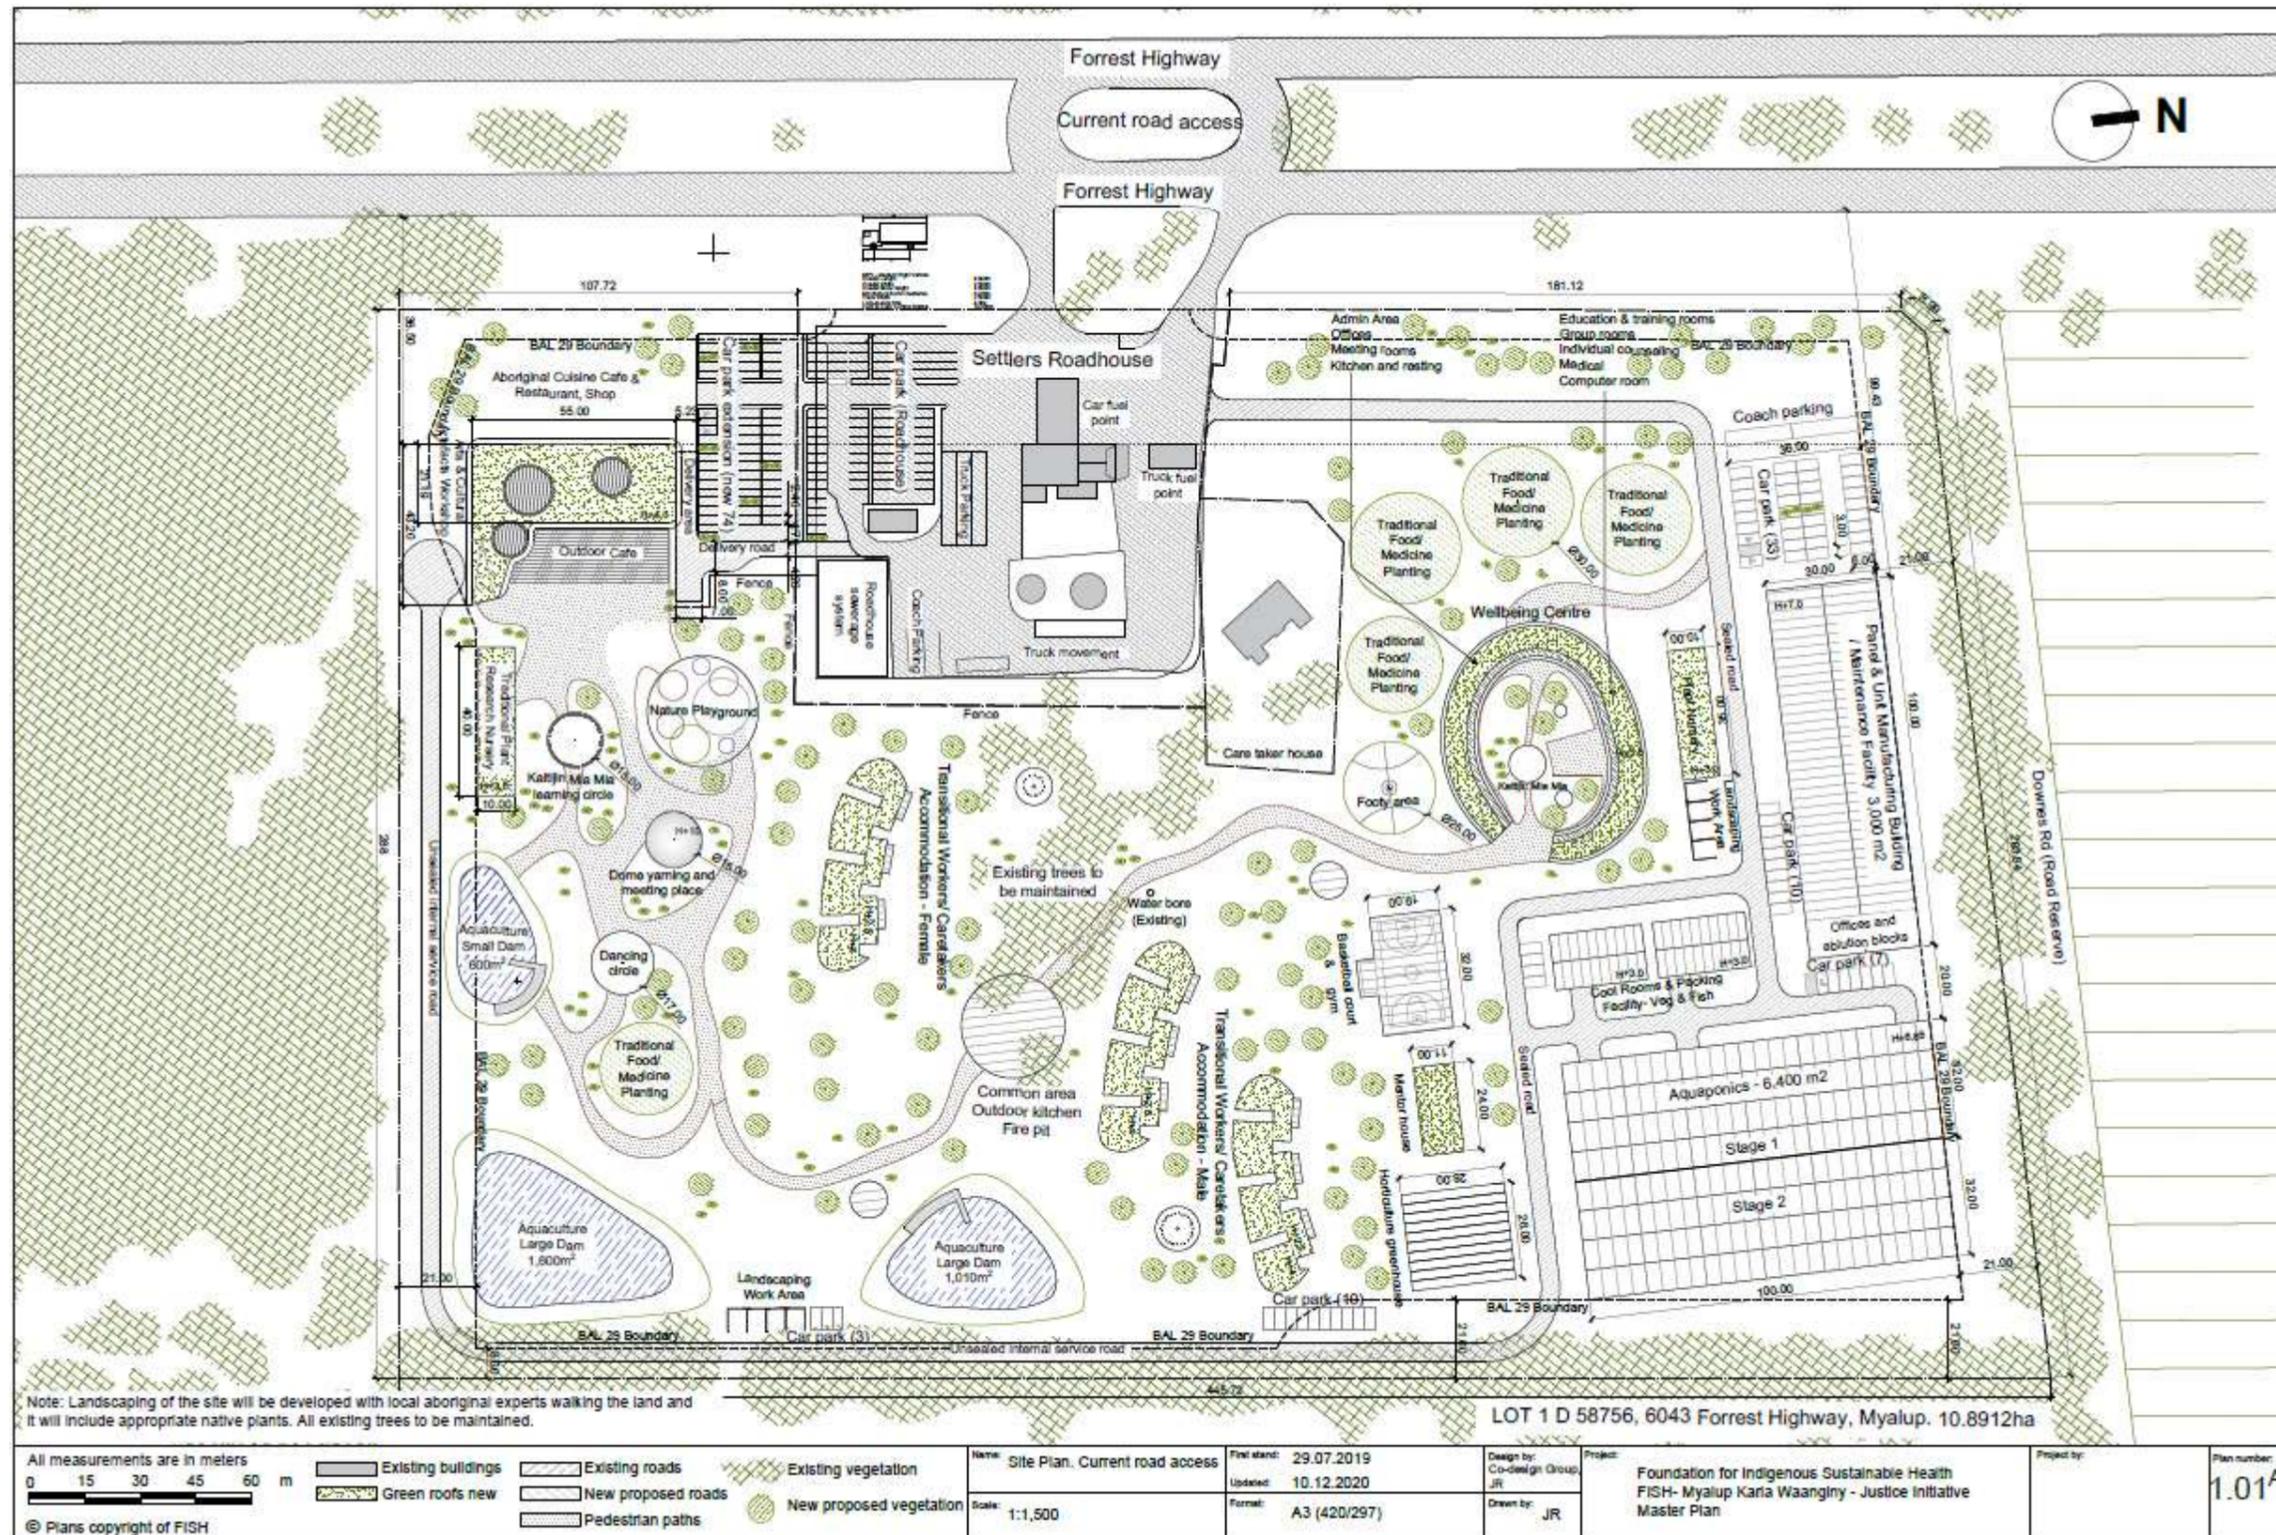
Proposed Site Plan Source: Foundation for Indigenous Sustainable Health
